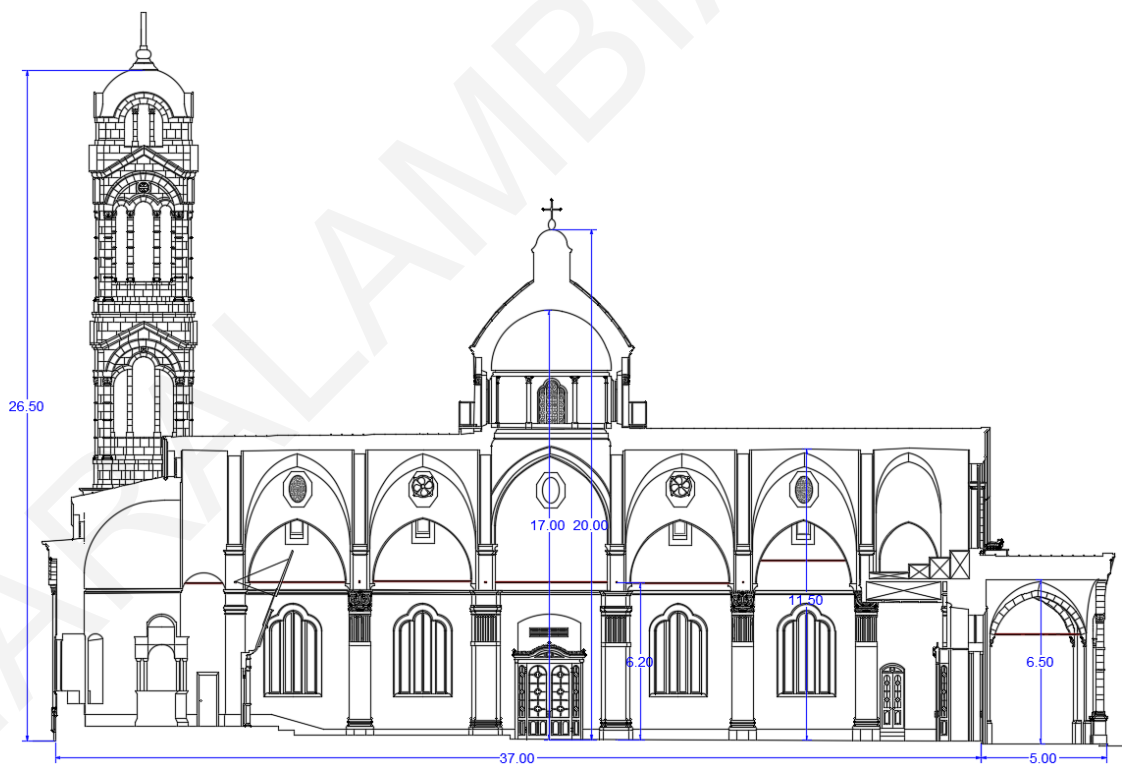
Section and dimensions of Faneromeni Church (Philippou)
